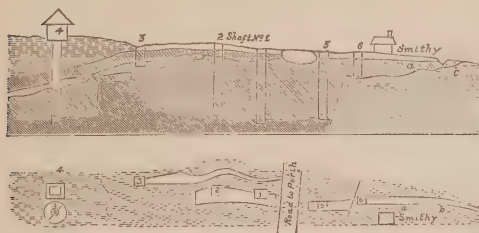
Longitudinal section and plan of Playfair mine. Scale—600 feet to an inch.
